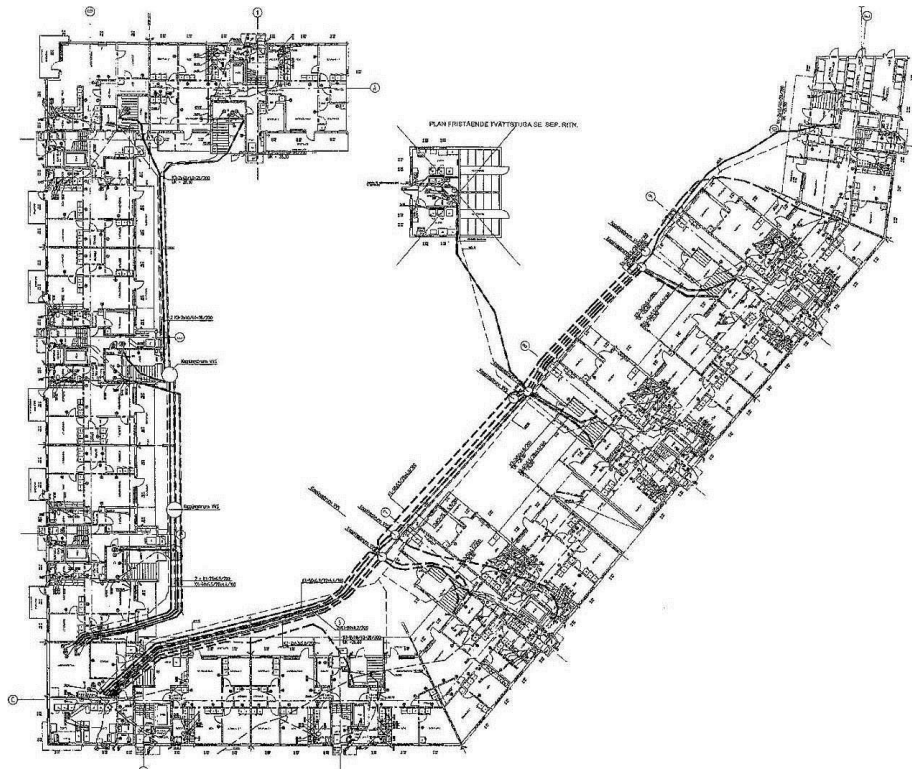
Buildings with an 800 meter long heating culvert placed outside of the building envelope (Bergqvist, 2011).
